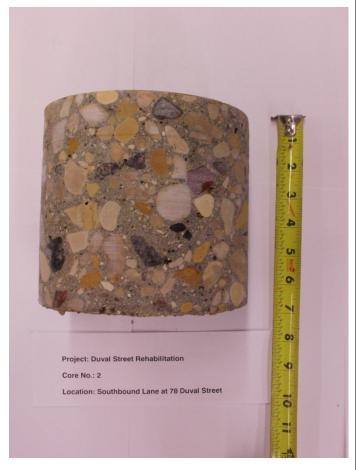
C02: Southbound lane at 78 Duval Street, 0.6 m from curb
